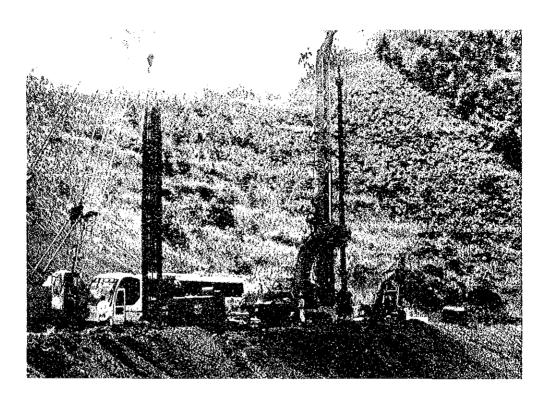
Cast-in-Place Reinforced Concrete Pile
